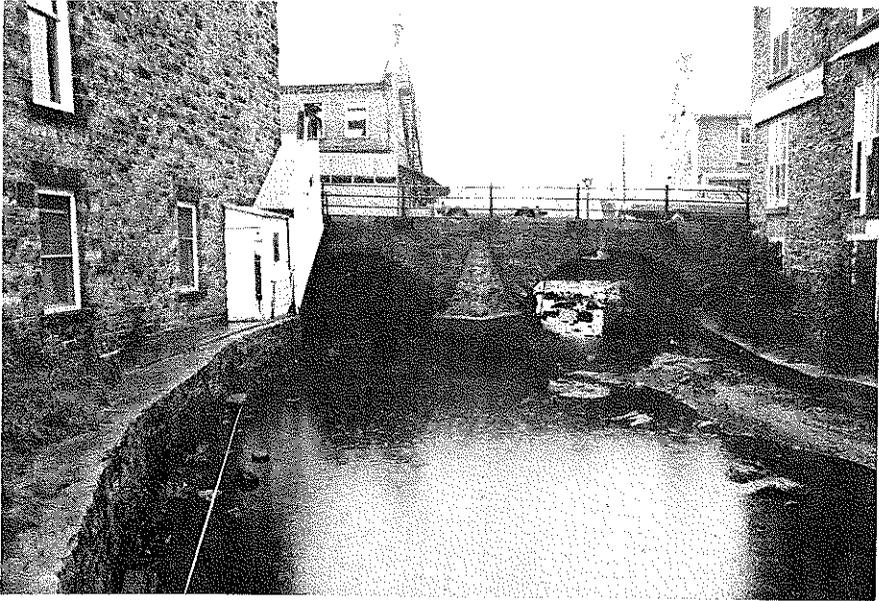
LOOKING UPSTREAM TO BECKWITH BRIDGE
